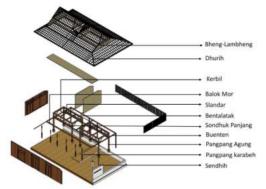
Structure of Taneyan Lanjhang Source: Research team, 2023
